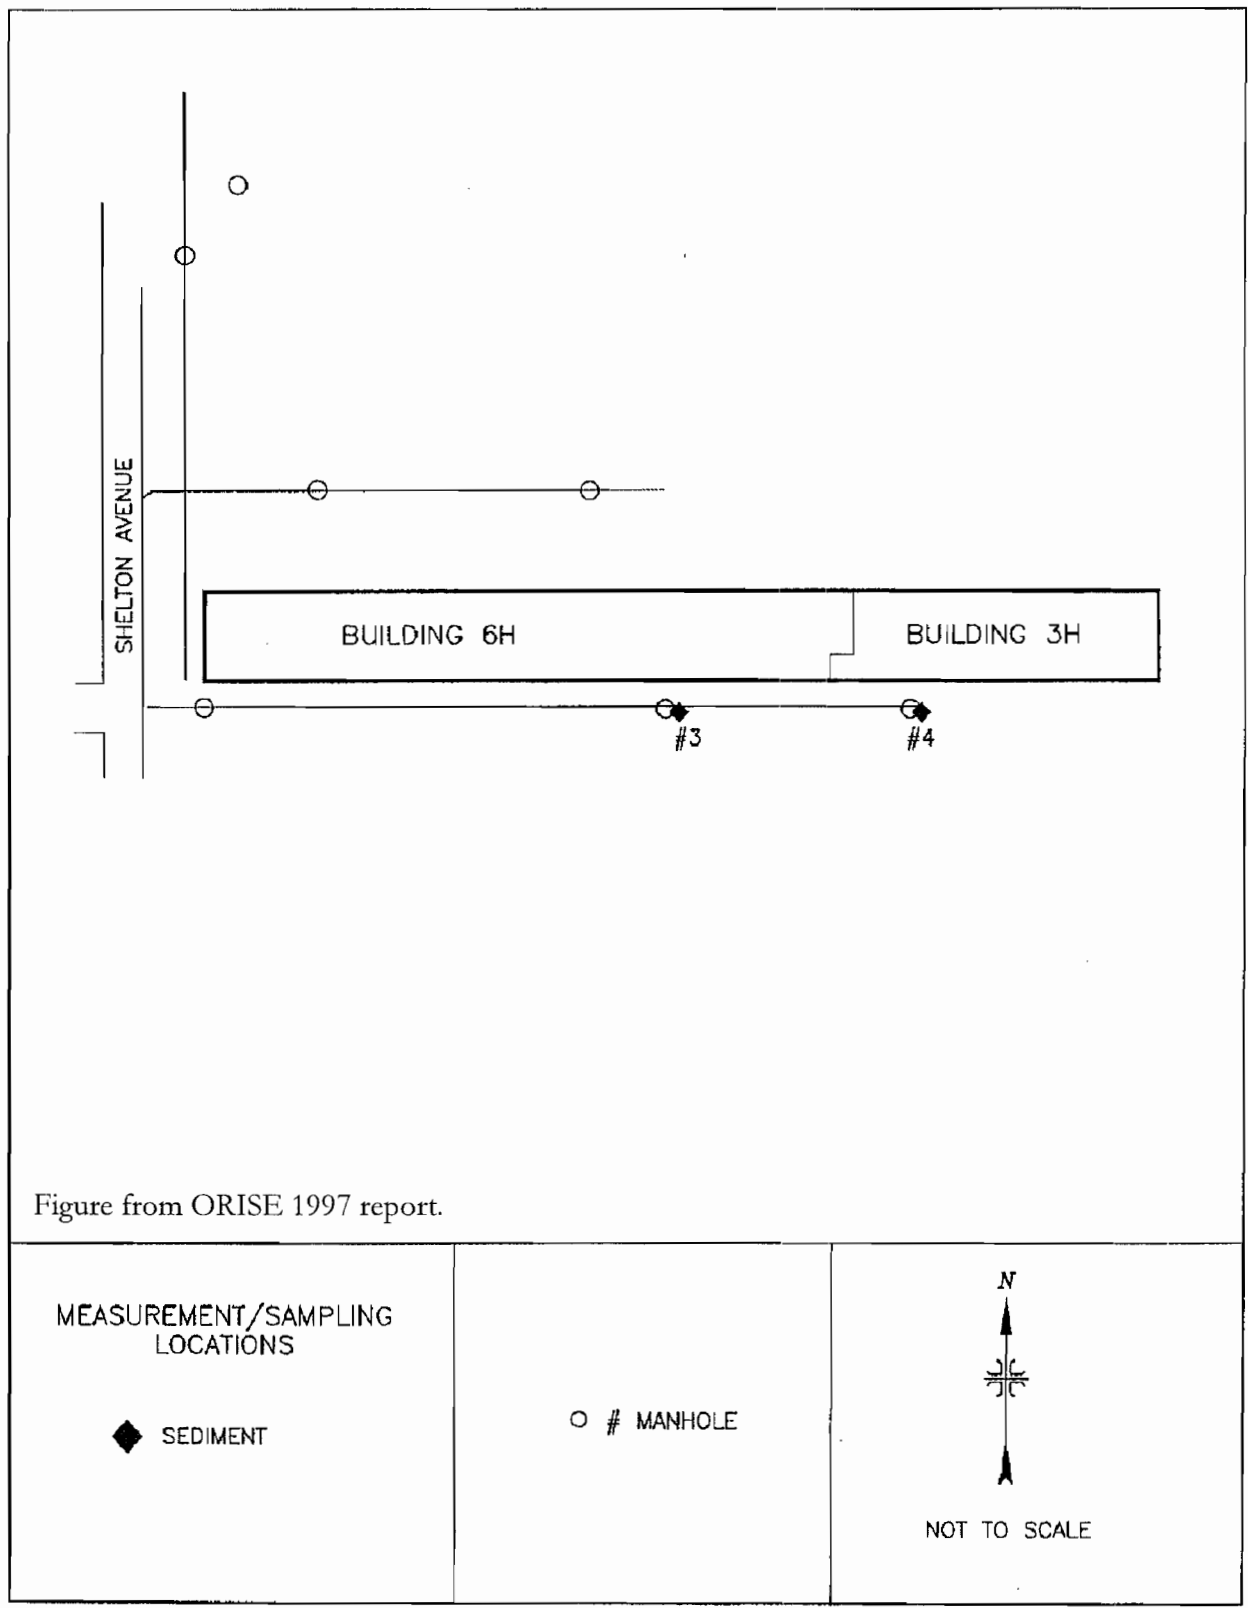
Plot Plan of Sewer System Indicating Previous ORISE Sampling Locations
